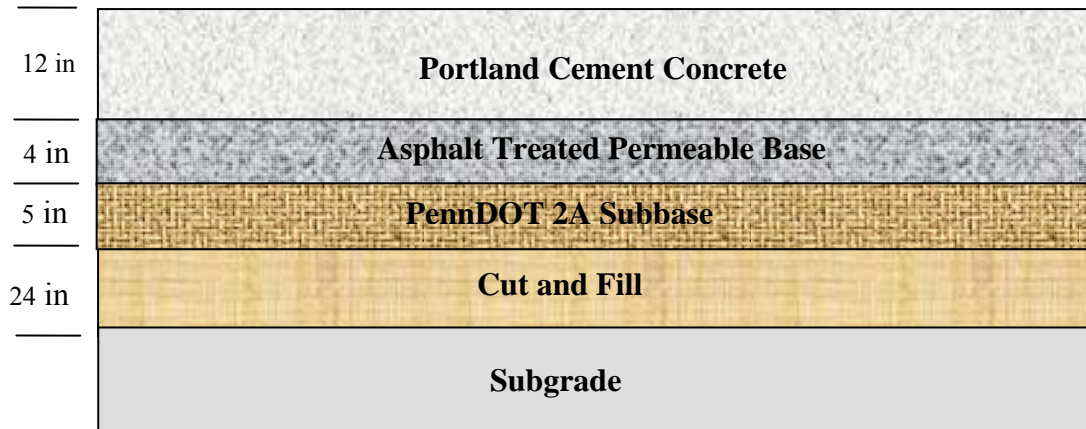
Cross-section of pavement structure (Wells et al 2005).
